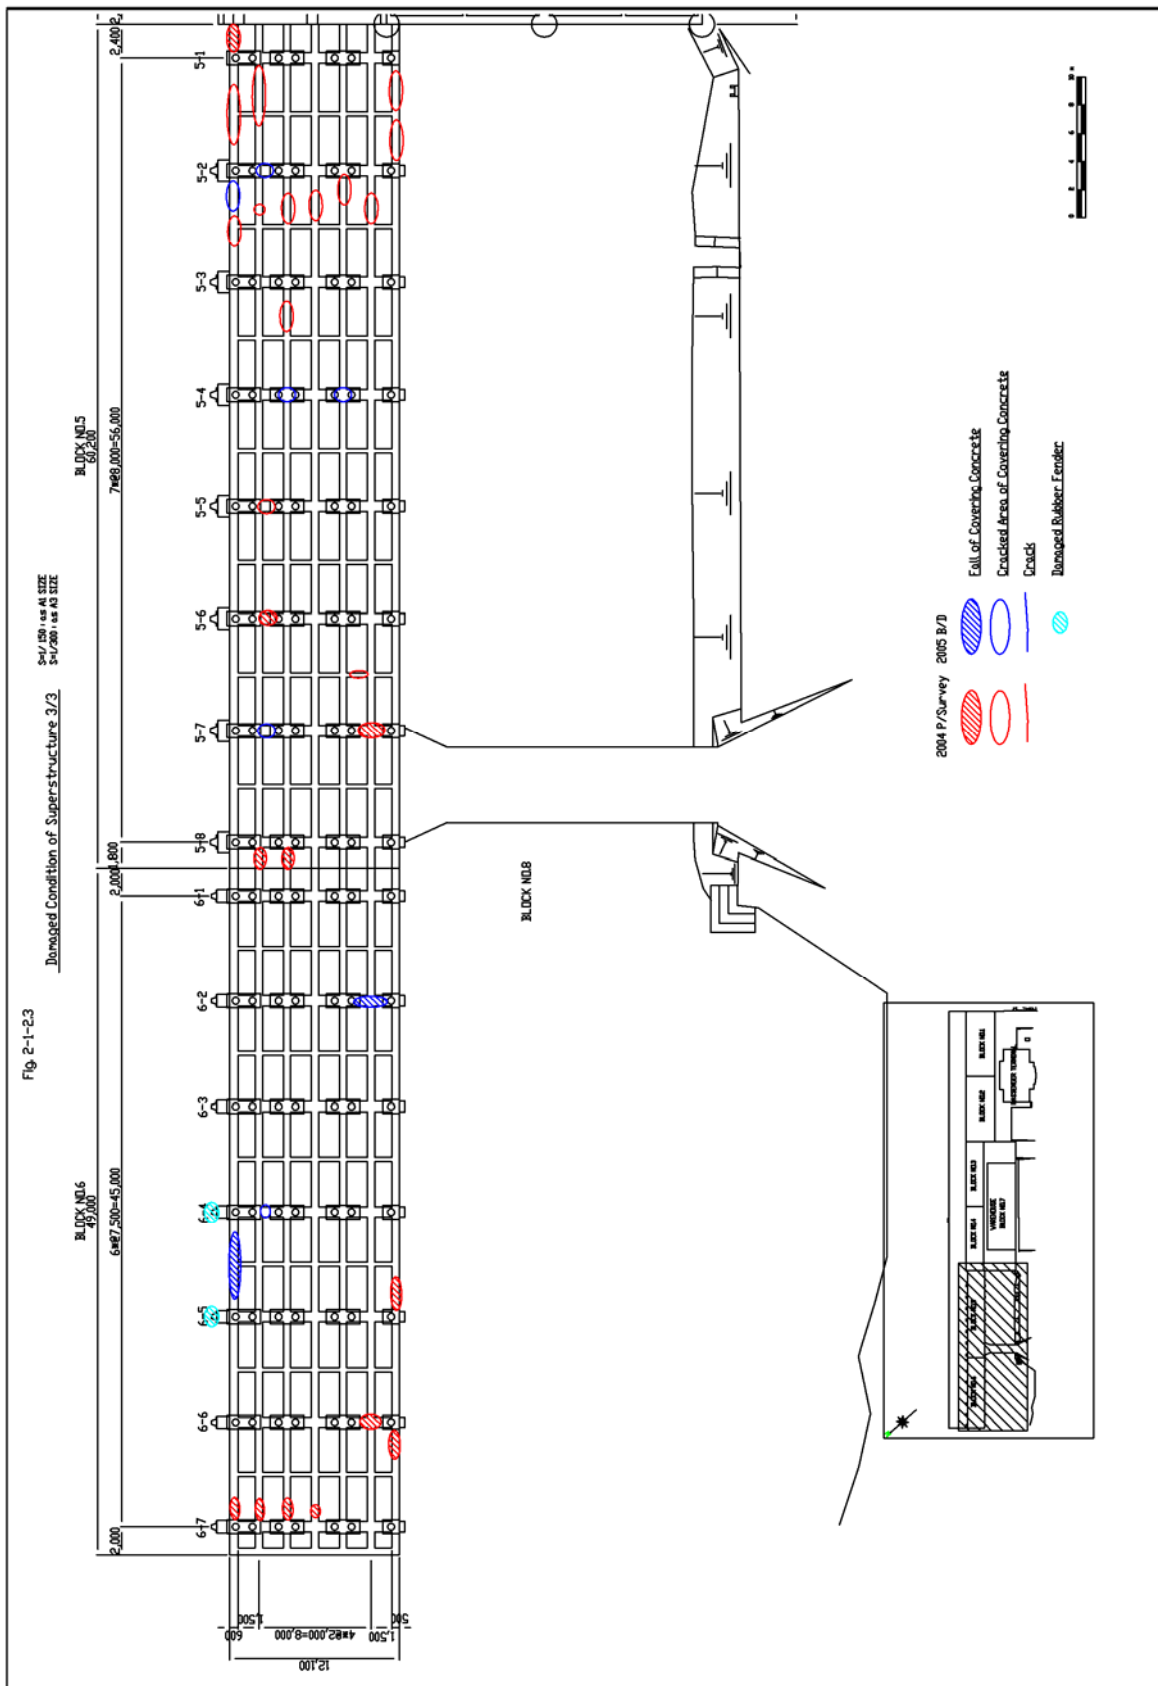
Damaged Condition of Superstructure (3)
